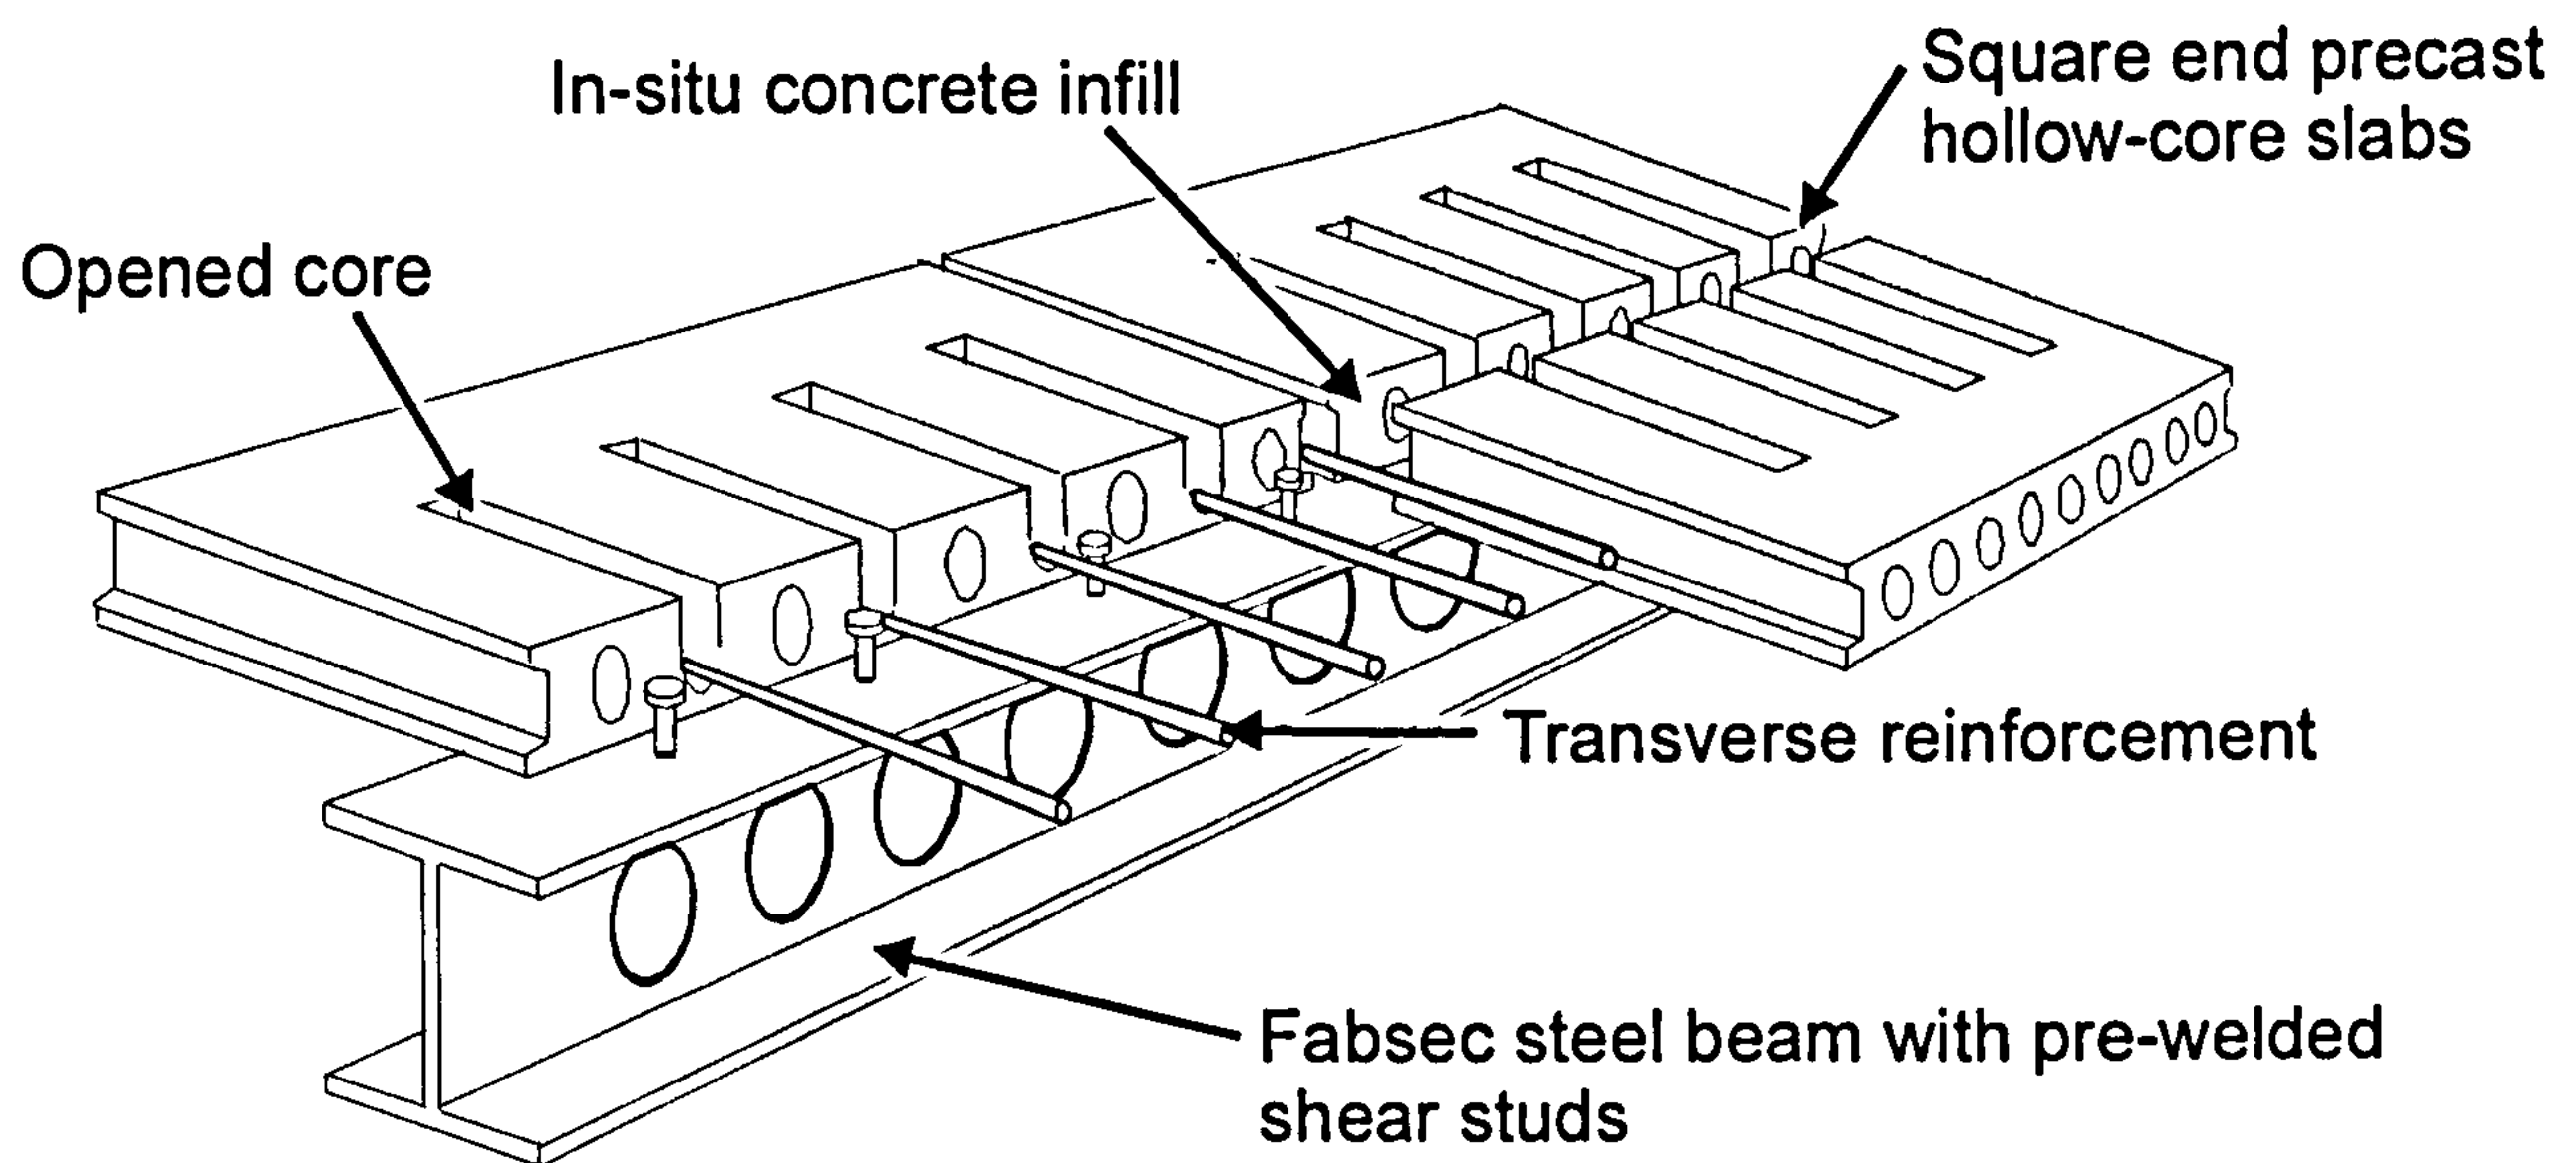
Composite Beam with Precast Hollow-Core Slabs
